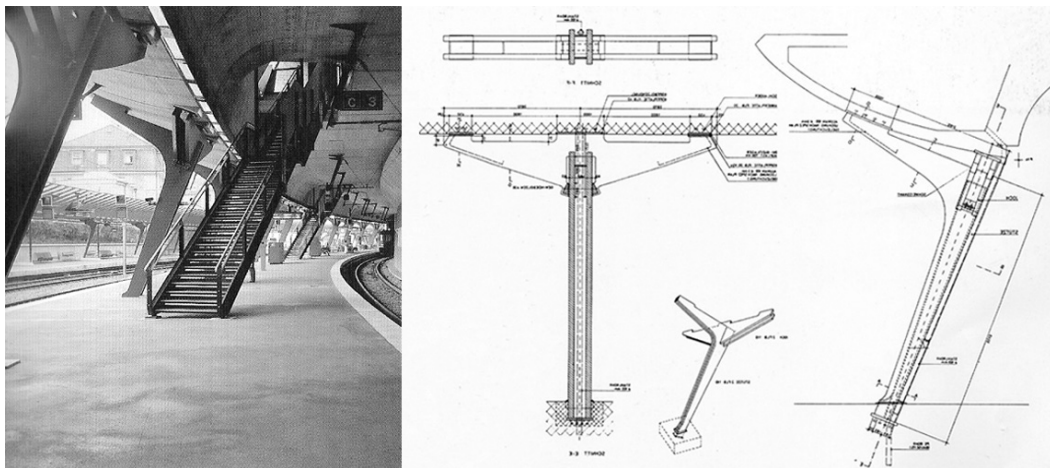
left: channel 2 \_ cantilevered platform roof \_ sub-channel 2 \_ view
